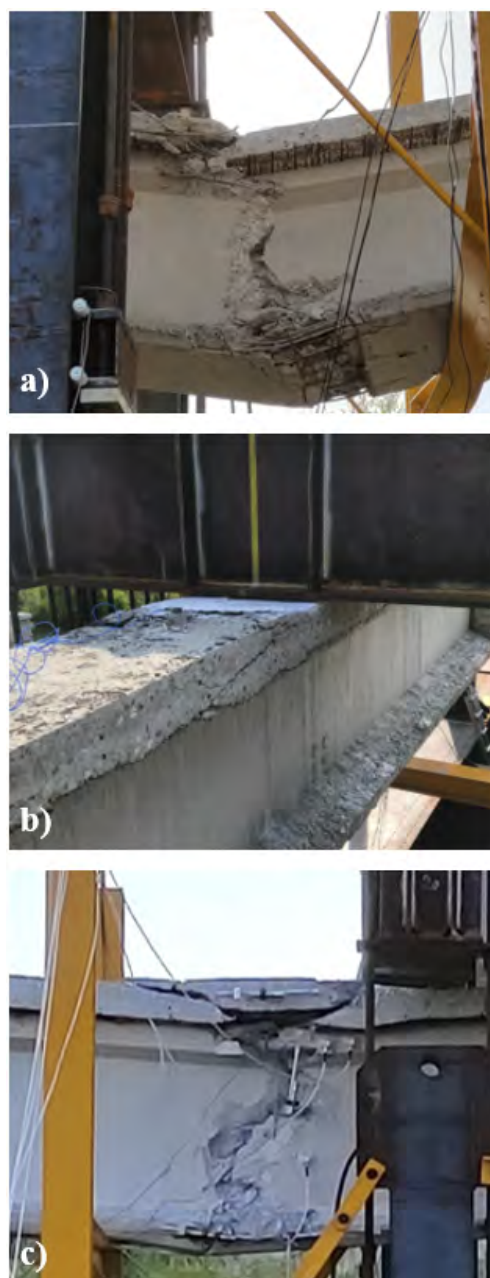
Failure zone: a) B3-P47/46, b) B8-P47/46, c) B4-P47/46.
